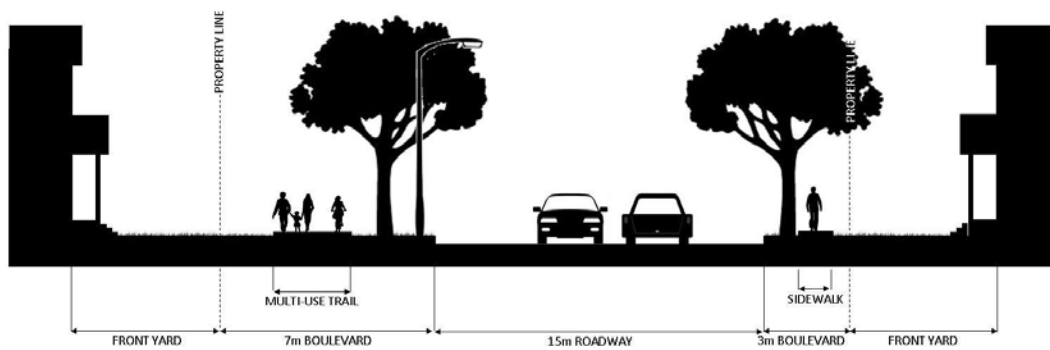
Typical Collector Road Section with Sidewalk and Multi-Use Trail
